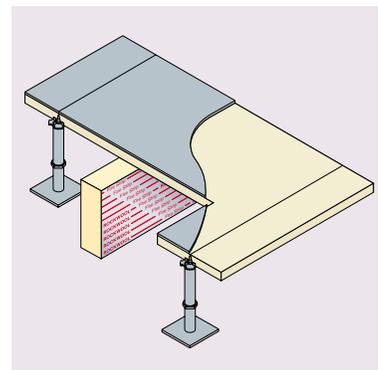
Access Floor FireStop Slab (typically directly under partition line)
